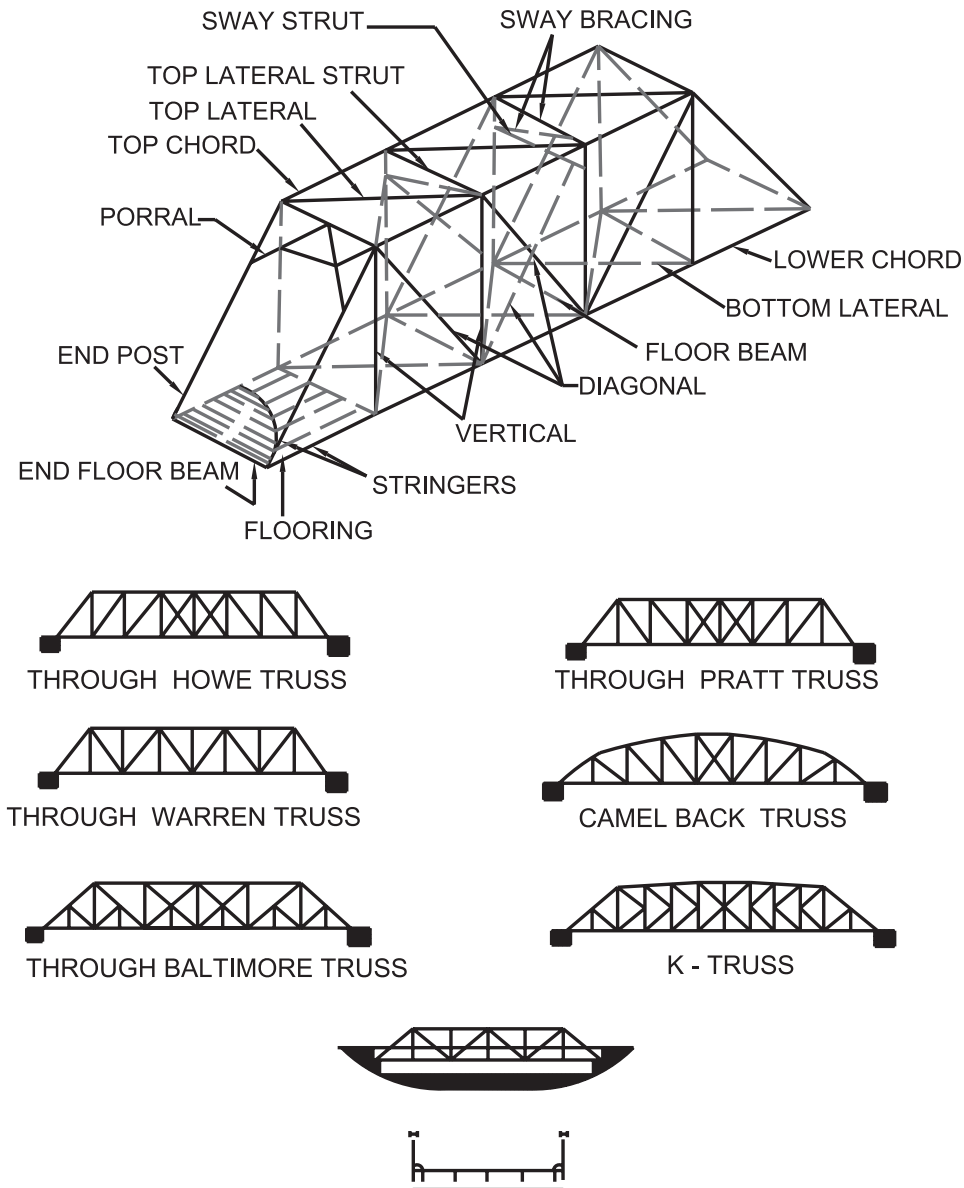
Configuration of existing steel trusses that require rehabilitation.
